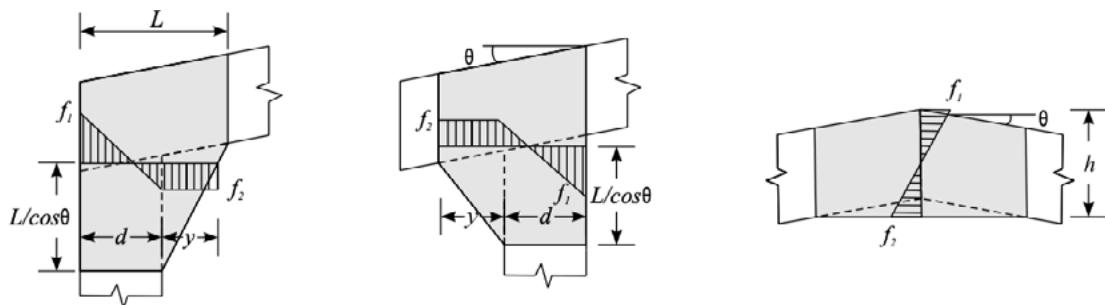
Assumed Distributions In Plywood Gusset Joints (Buchanan, 2007)
